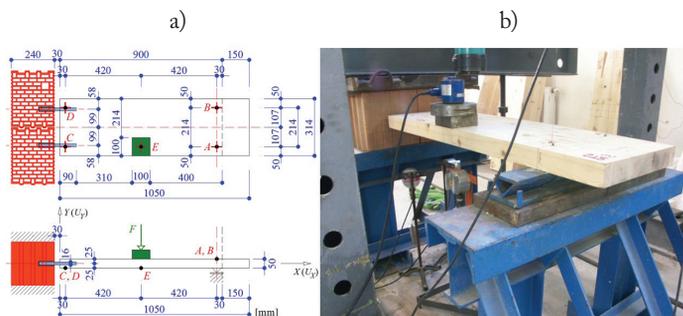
Scheme of arrangement of test with marked measuring points a) and loading track with the tested specimen ST2 b).
